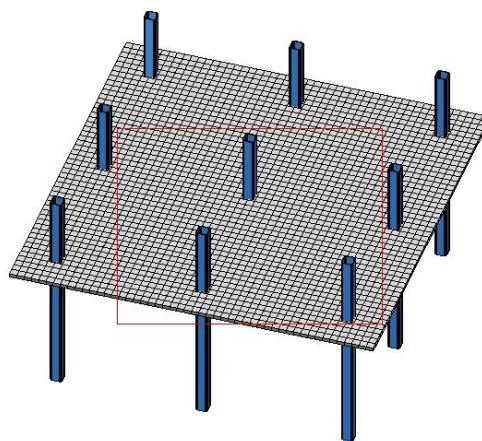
Calculated model of reinforced concrete slab reinforced with external prestressed reinforcement
